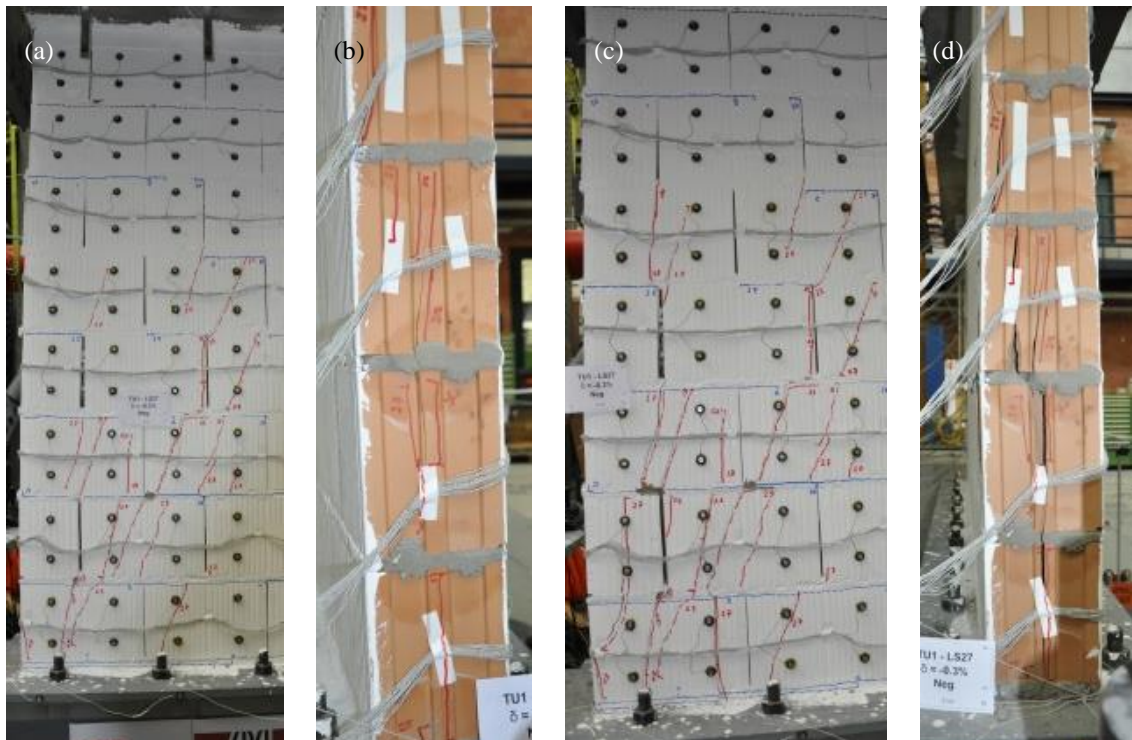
Crack pattern at LS27 ($\delta = -0.3\%$) of the compressed corner of the first storey of the URM wall. Before (a, b) and after (c, d) the horizontal load failure.
